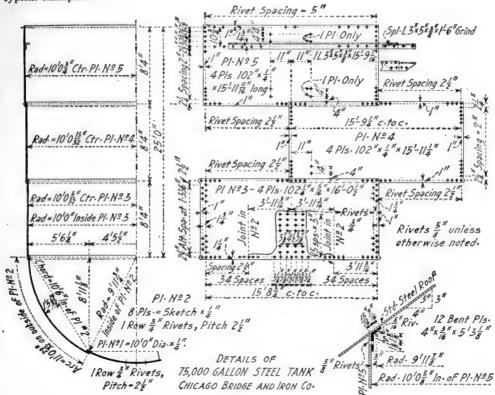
DETAILS OF TANK AND HEMISPHERICAL BOTTOM. CHICAGO BRIDGE & IRON CO.
